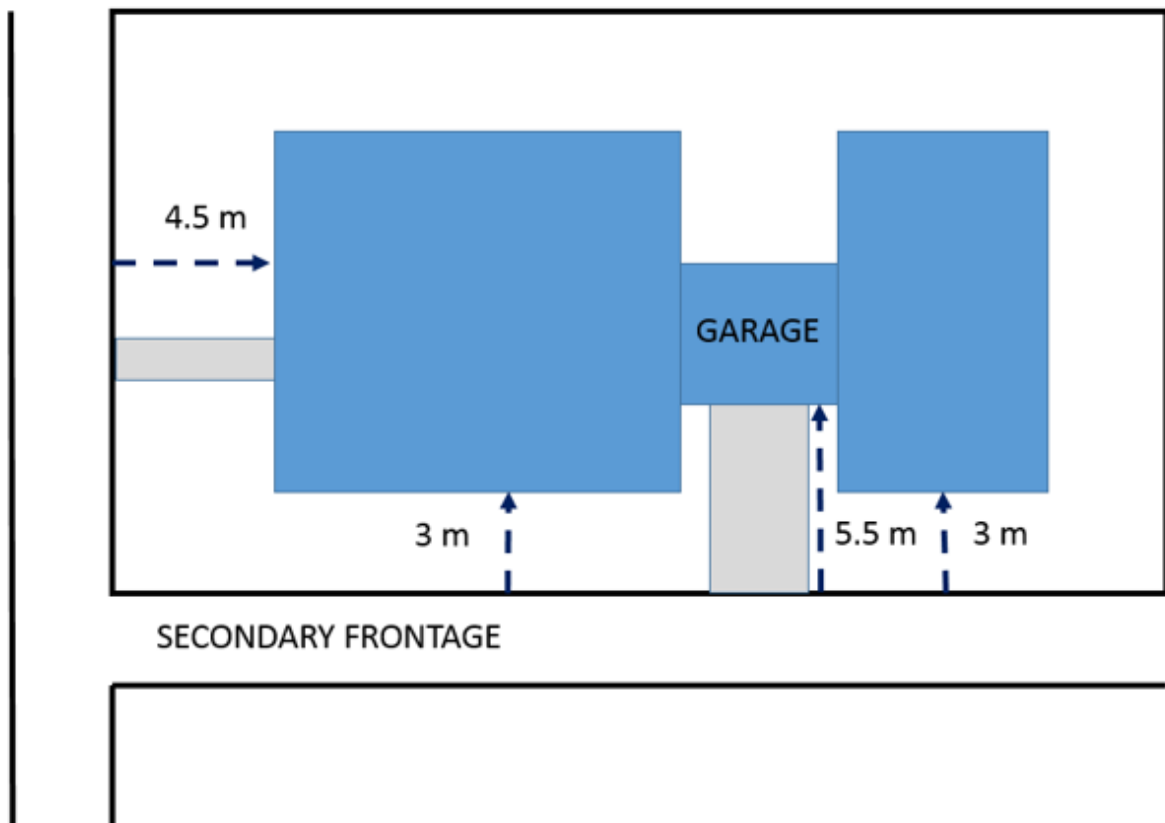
Corner allotment with the main entry to the primary road and the garage to the secondary road, with a setback minimum of 5.5 metres
